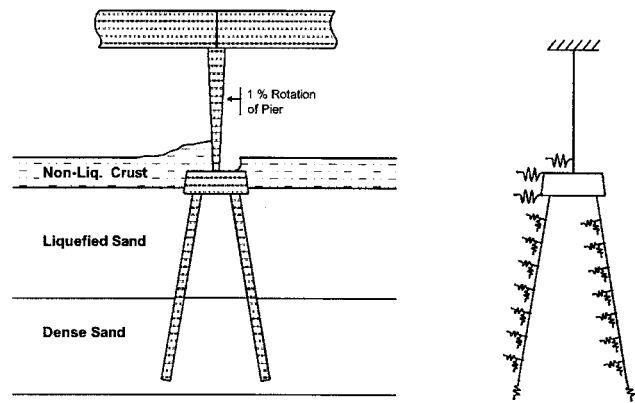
Schematic of Landing Road Bridge and beam on nonlinear Winkler foundation analyses.
